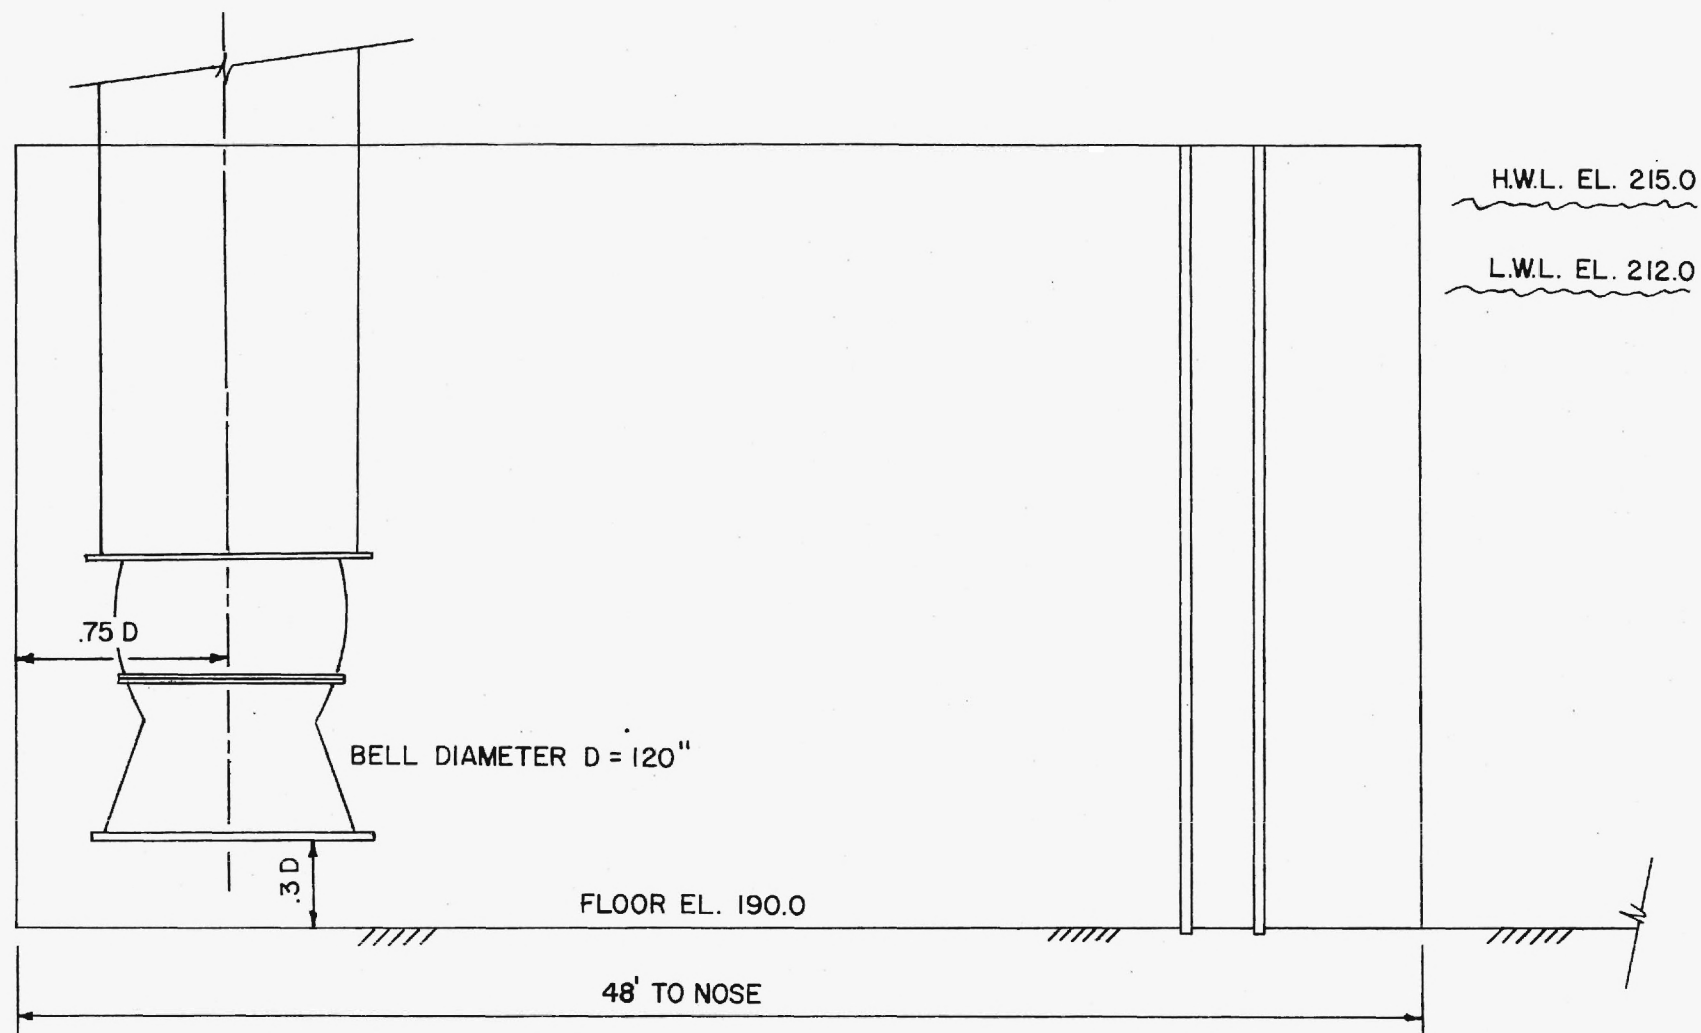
ELEVATION VIEW OF PUMP INTAKE STRUCTURE, PLANT VOGTLE
